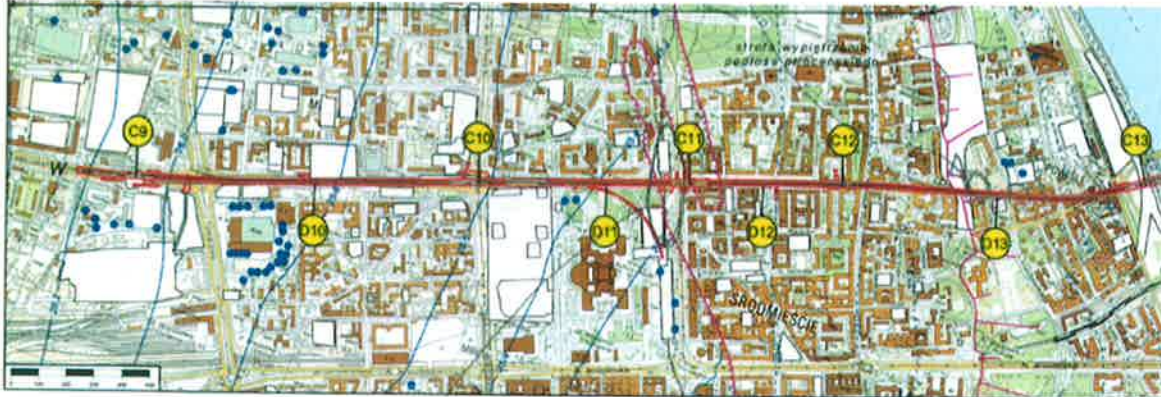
Plan view of Tunnel from Station C9 to C13
